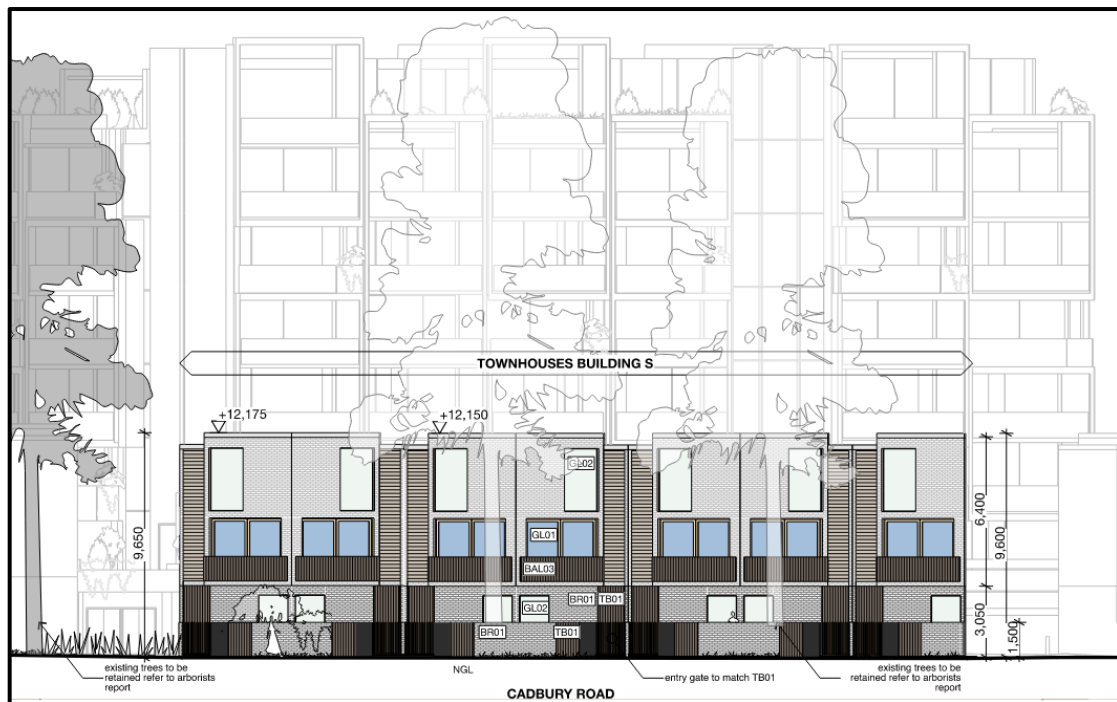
The northern elevation of Buildings S (townhouses) facing Cadbury Road, with the the existing trees in the foreground and Building P in the background.
